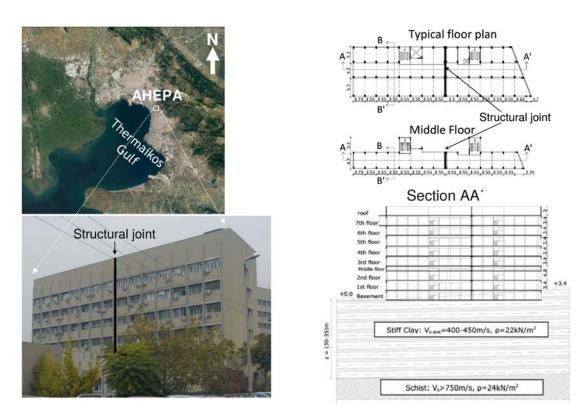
The AHEPA hospital. Typical floor plan and middle floor with the structural joint and a typical soil profile in correspondence of AHEPA hospital building.
